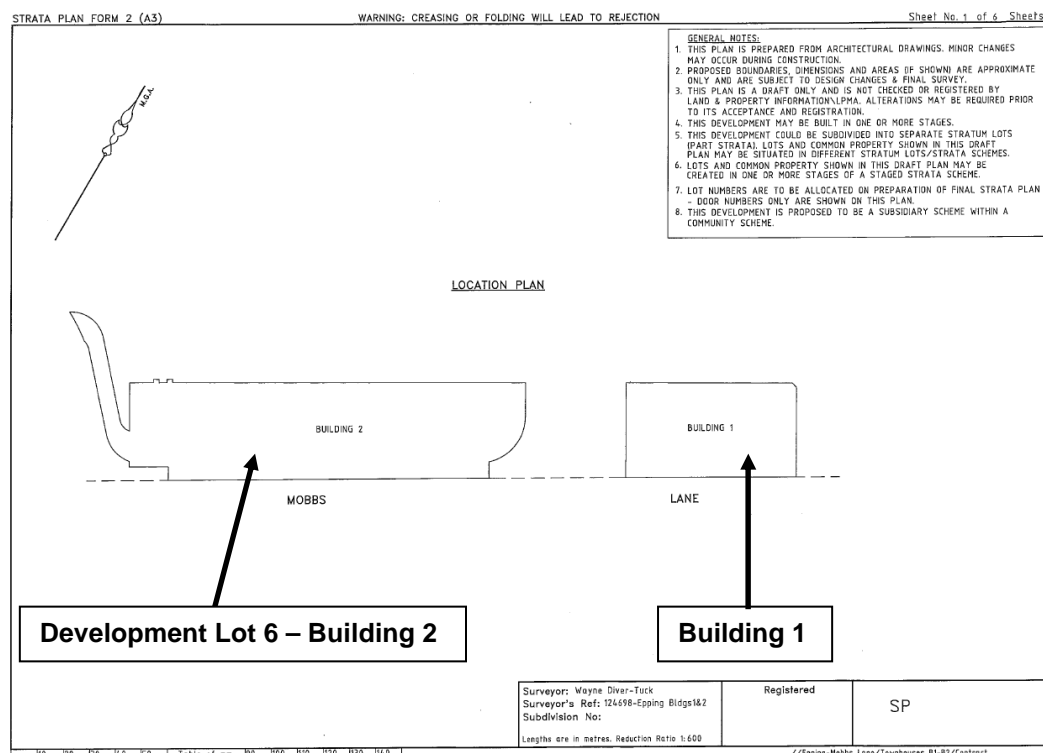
Location plan of Building 1 and Development Lot 6 (Building 2)
